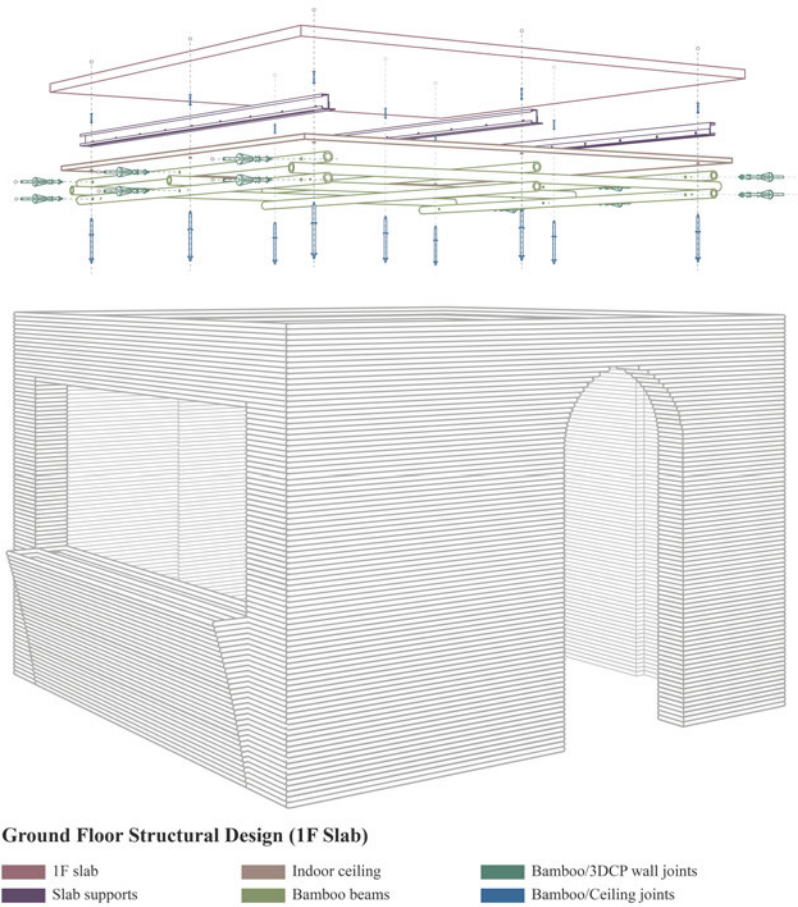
Ground-floor ceiling structural details in explosion drawing.
